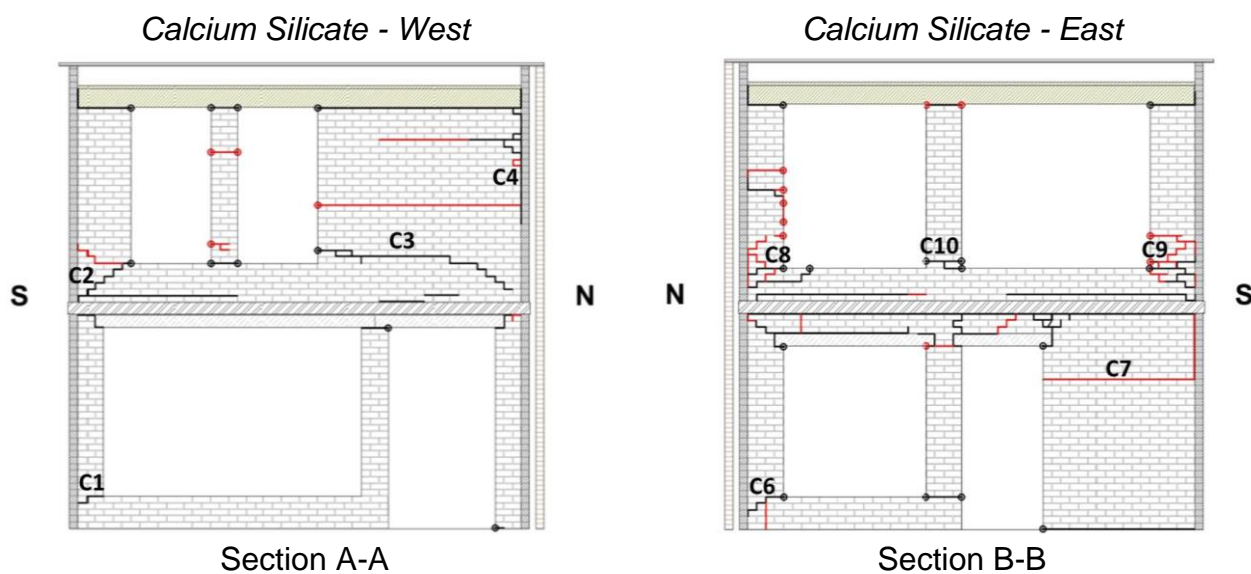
EQ-NPR 100% cracks - Calcium silicate longitudinal walls.
